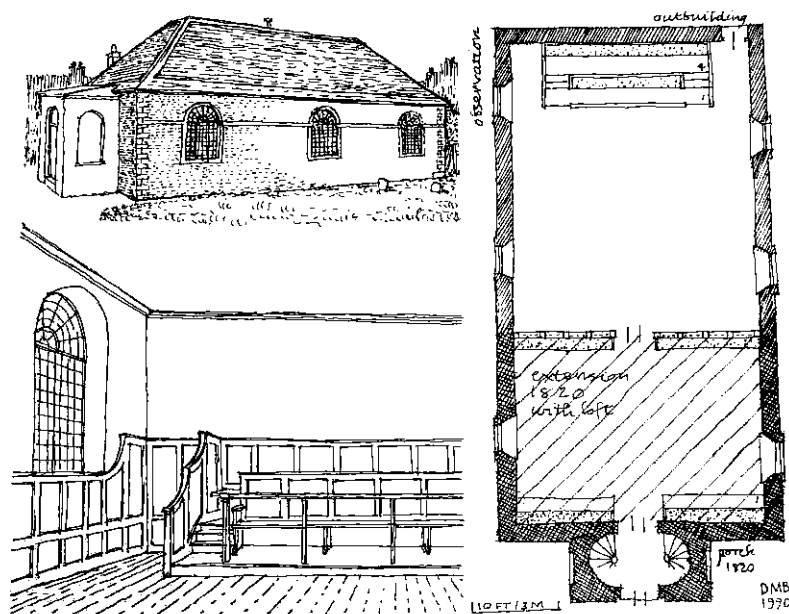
Perspective, interior detail and plan (southwest is at the bottom; not to scale) of the former meeting house at the corner of Lagland Street and Prosperous Street, Poole (Butler, vol.1, p. 151)
